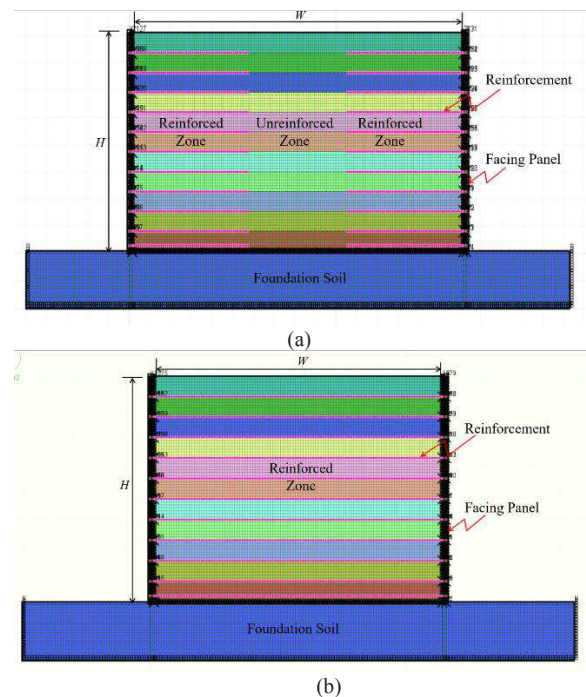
Numerical model of BBMSE walls with (a) unconnected reinforcement, and (b) connected reinforcement
